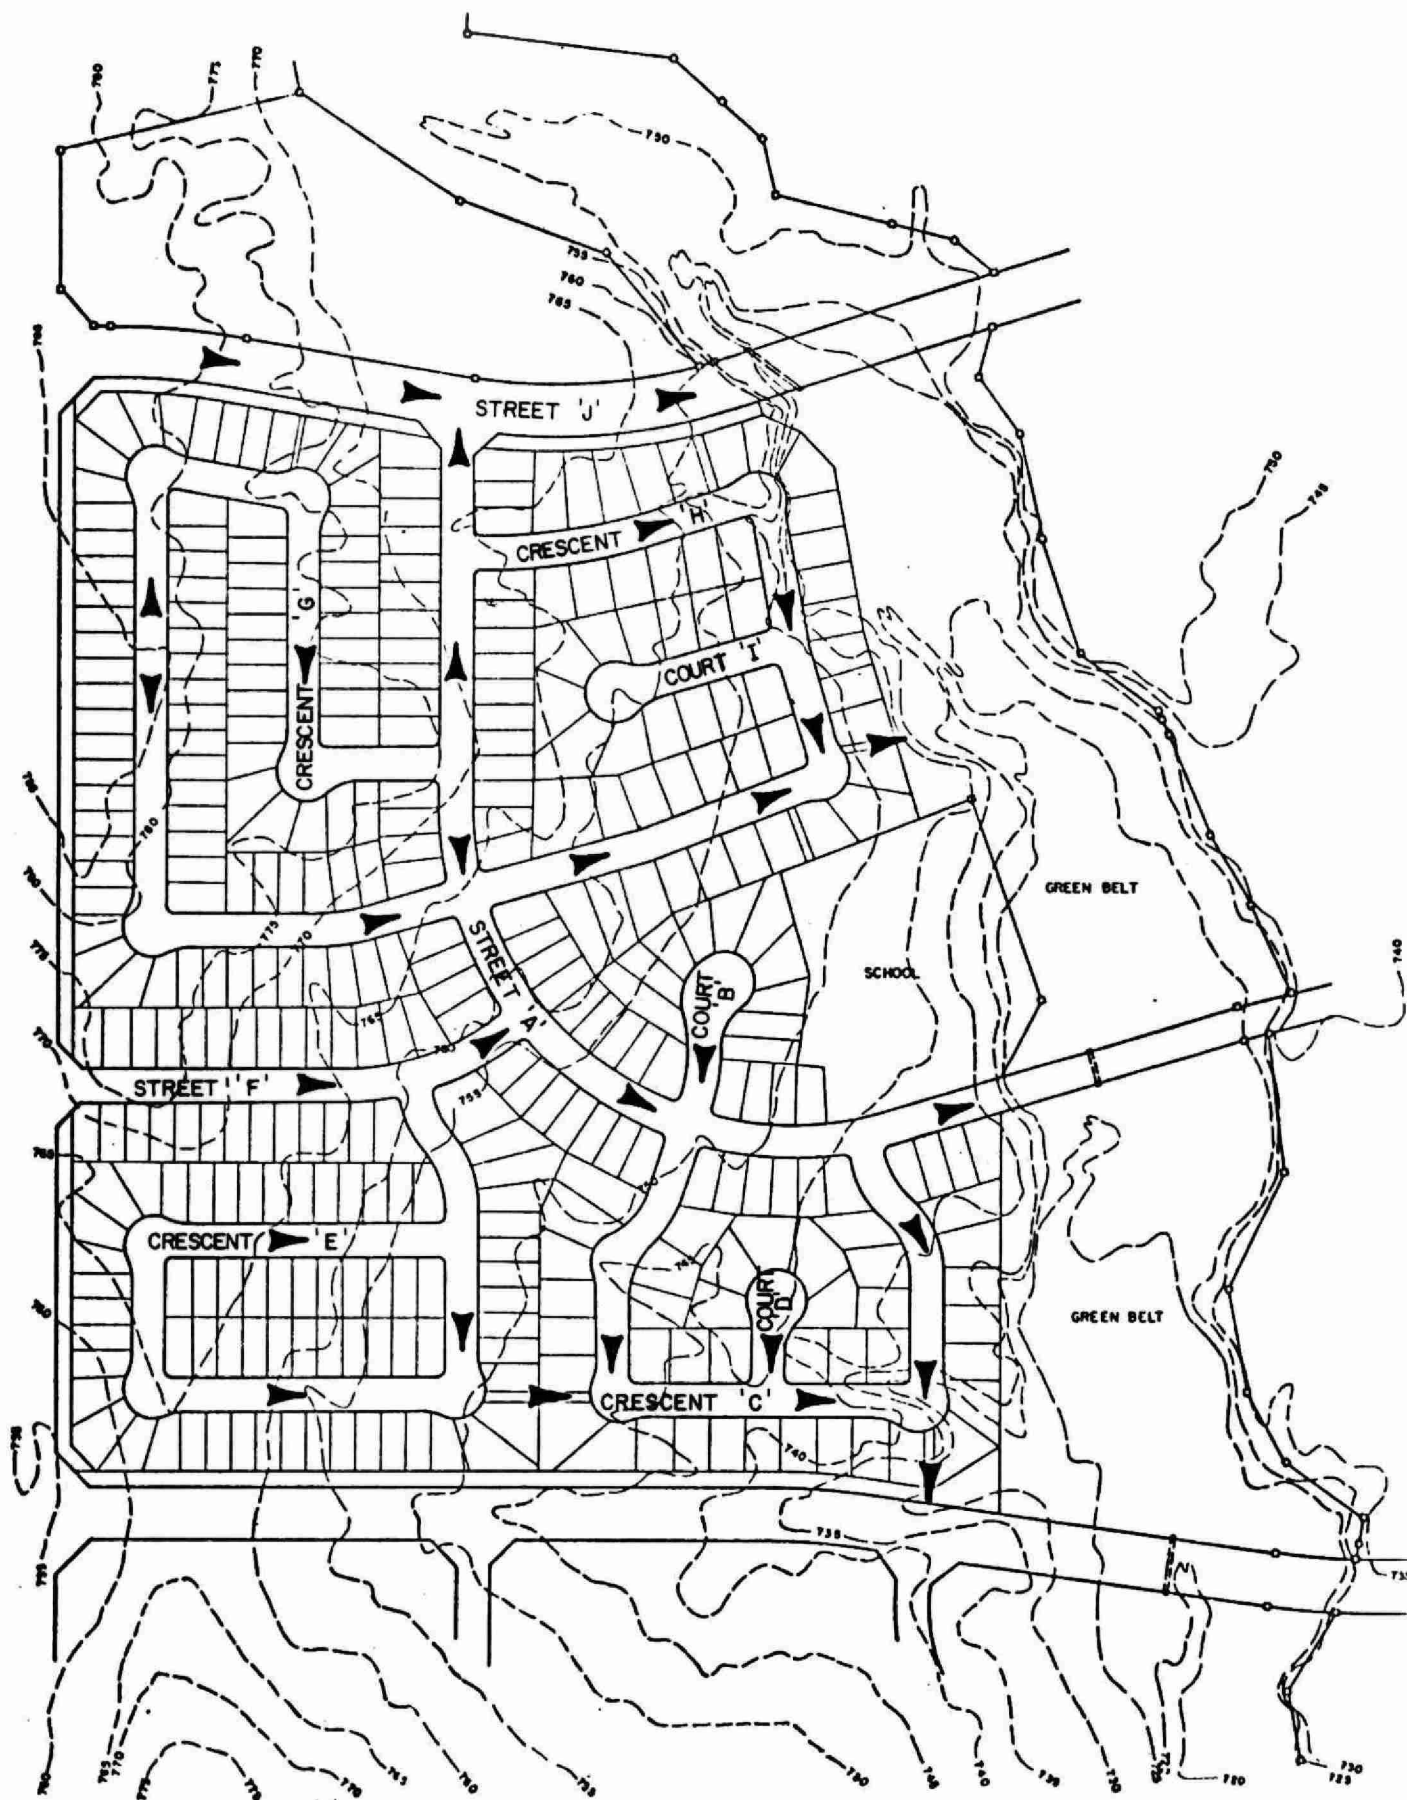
SITE PLAN WITH ROUTE OF SURFACE RUNOFF
